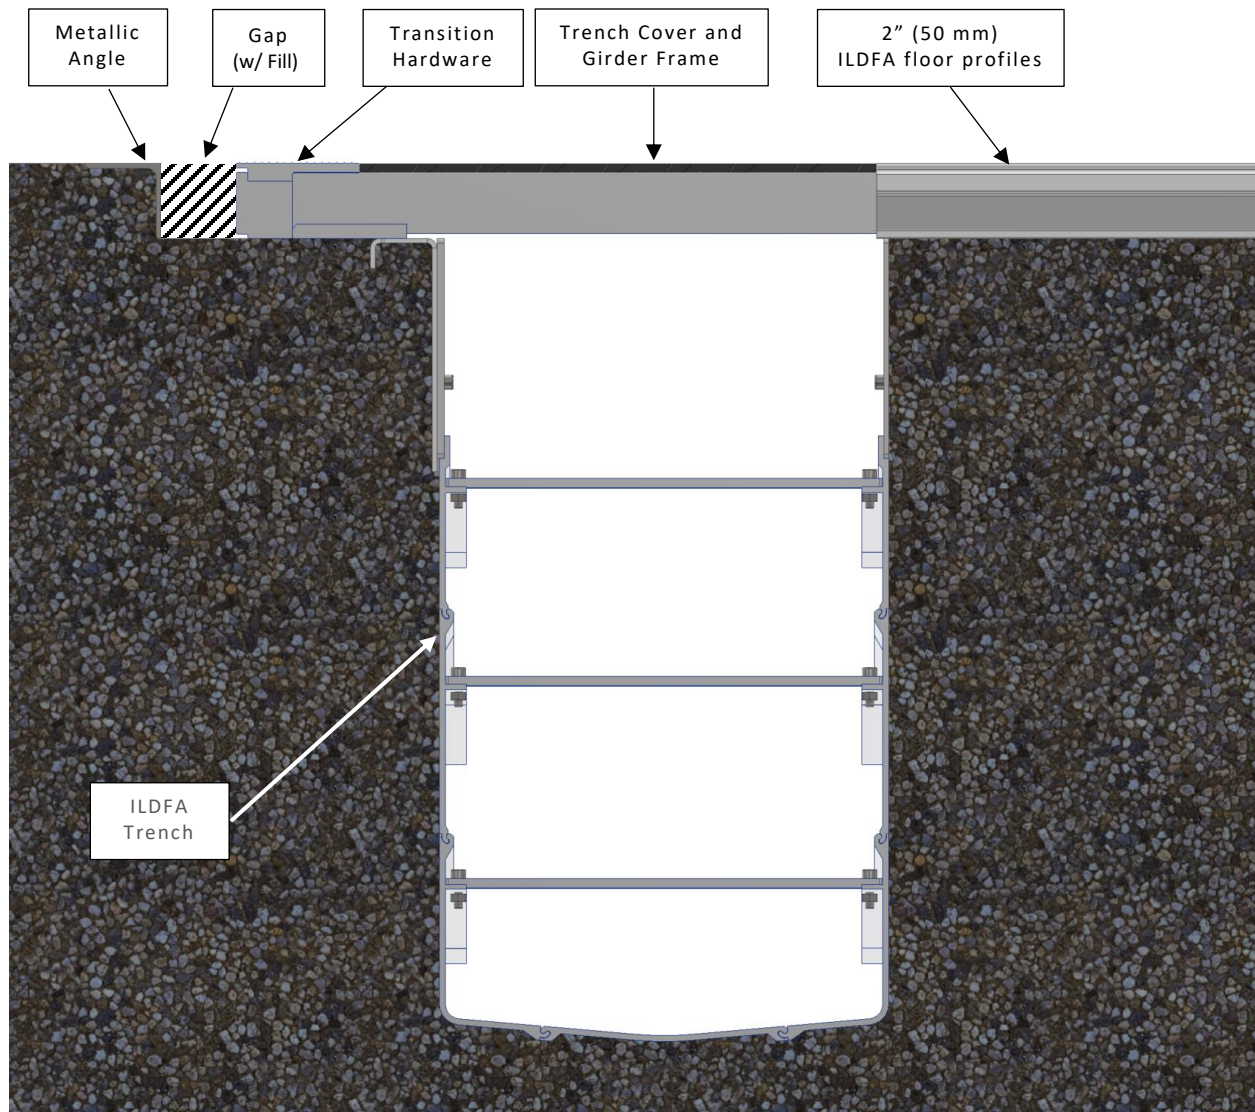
Transition from Hangar Slab to ILDFA at trenches
